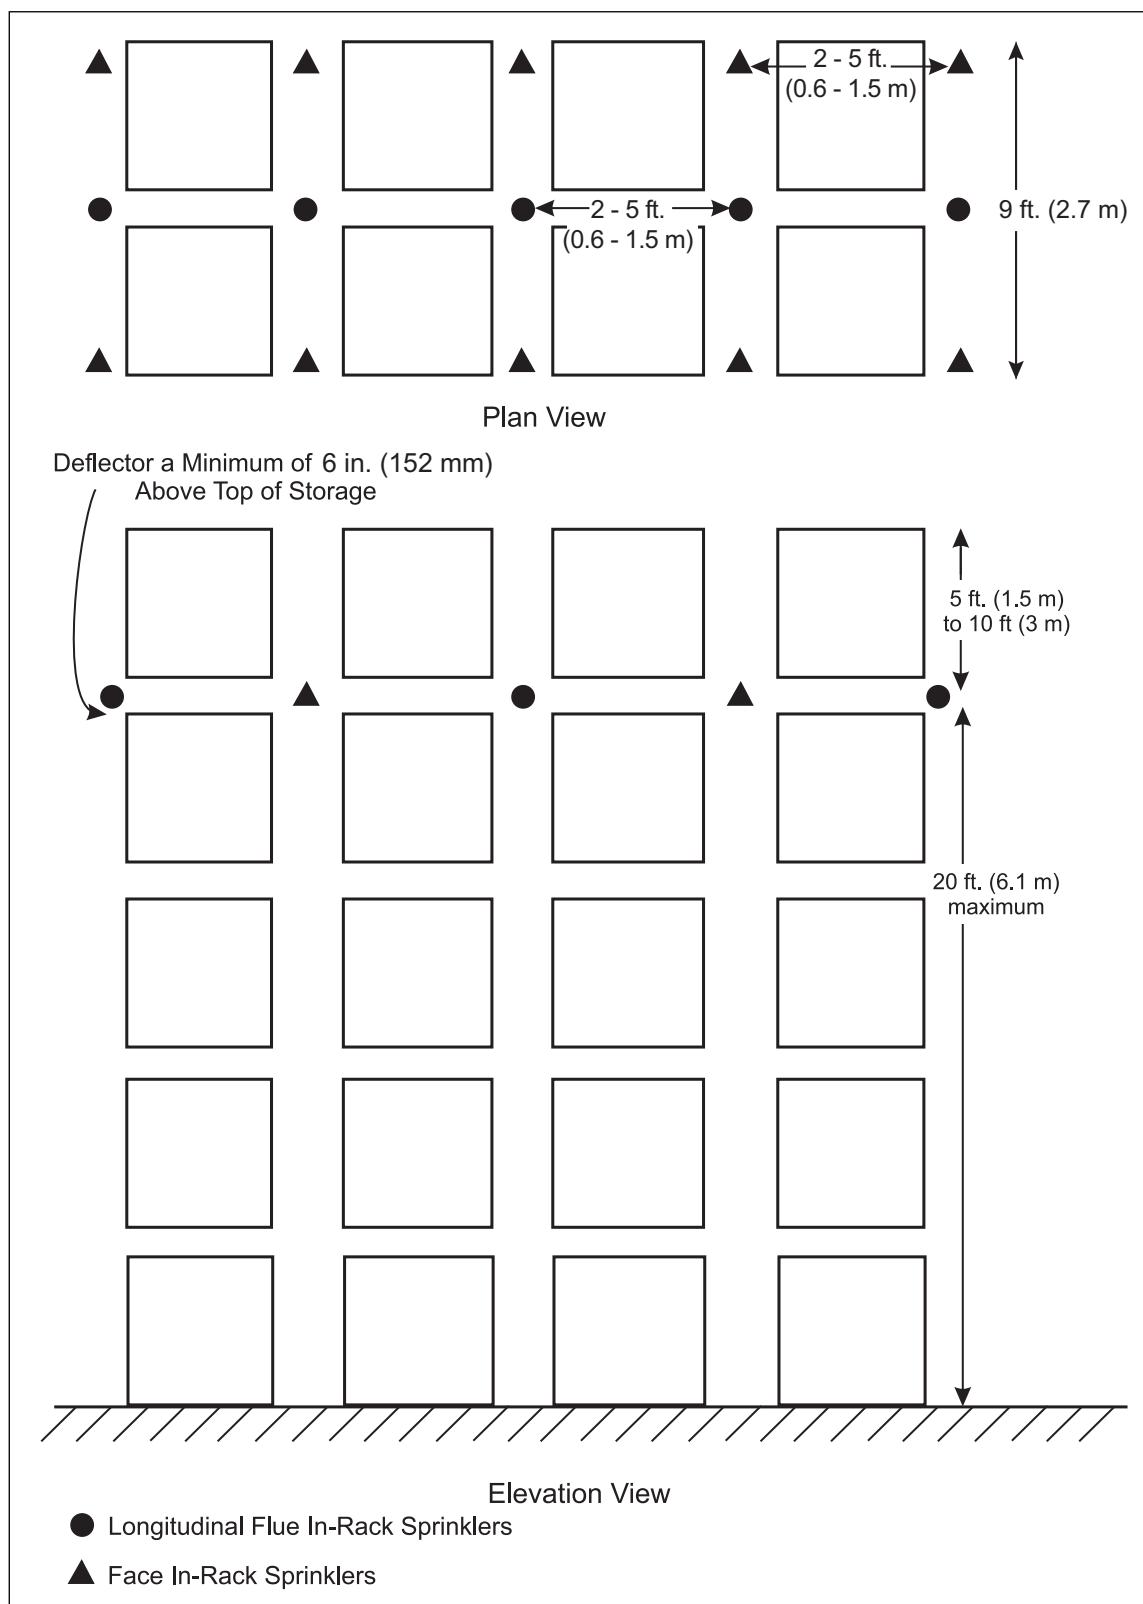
Double-row rack sprinkler layout: fire protection scheme E
